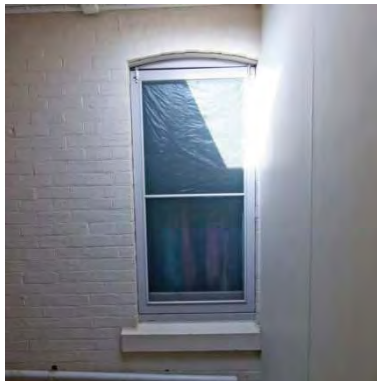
1907 exterior lower floor showing 1907 central wing windows
